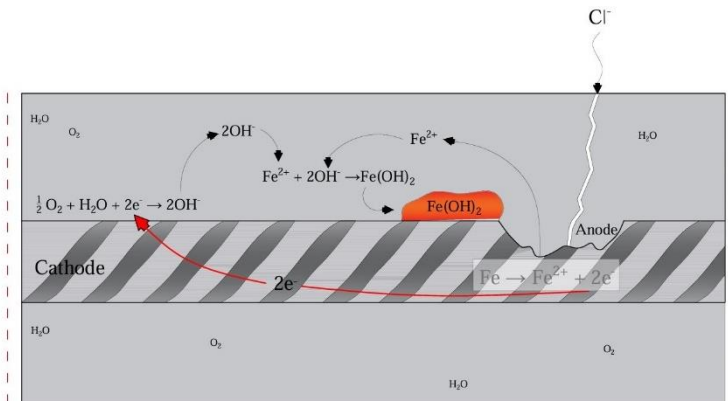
Schematic sketch of chloride-induced corrosion in reinforced concrete structure.
